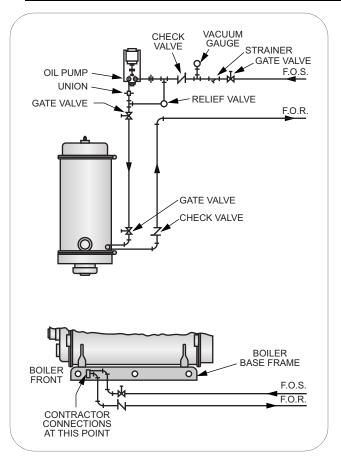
No. 2 Oil Piping, Single Boiler Installation, Remote Oil Pump
